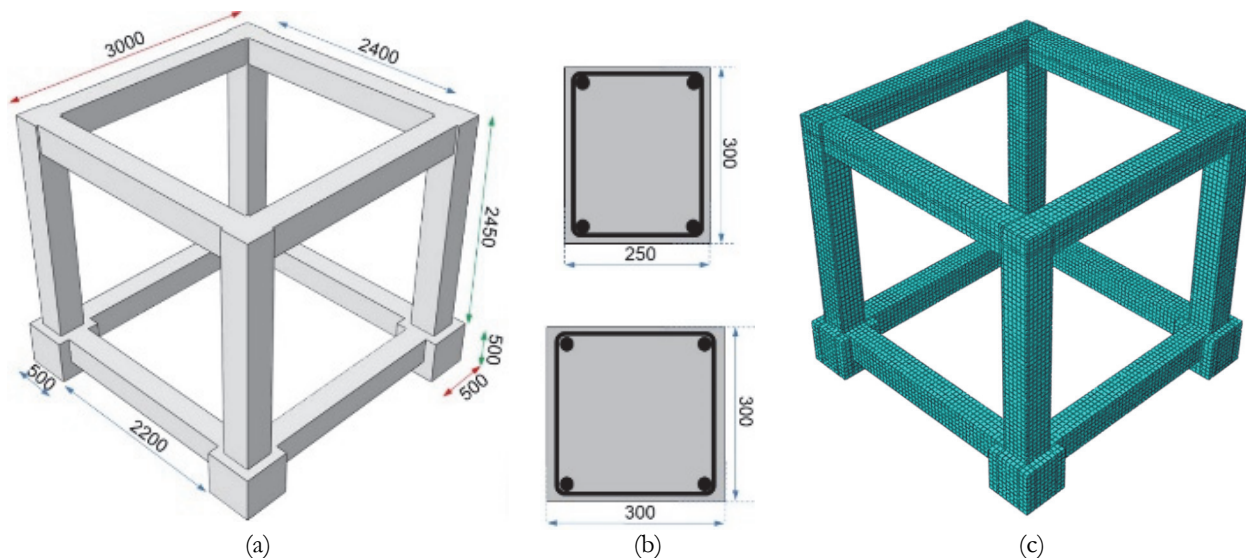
Numerical model (a) Finished dimensions, (b) beam and column sections, and (c) meshing.
